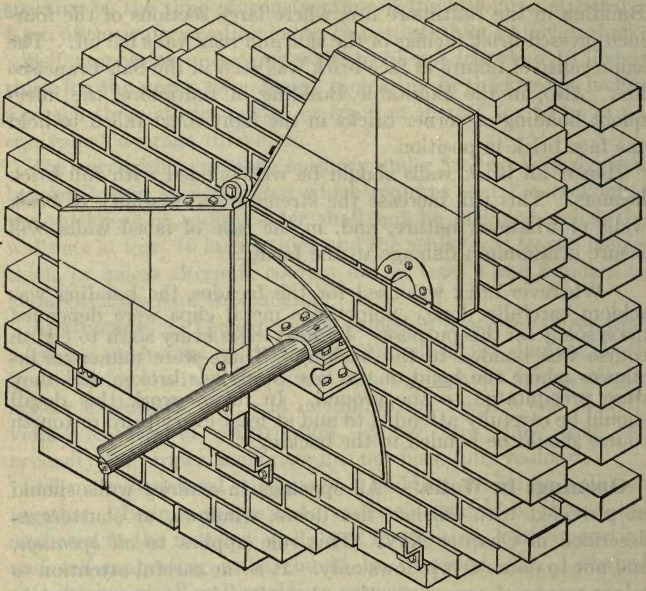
Standard Cut-off for Shaft Opening between Buildings.
